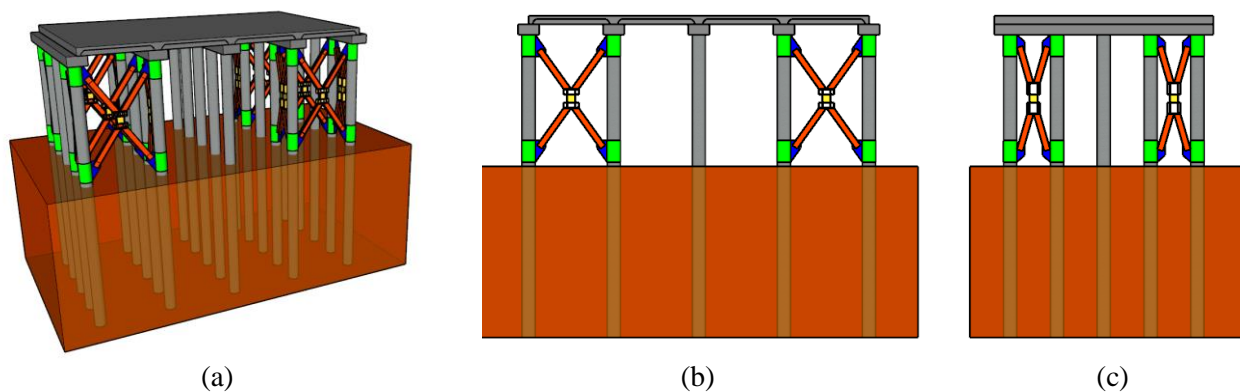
Proposed PSSV braced with steel bracing and SPD addition: (a) 3D view, (b) side view, (c) front view
